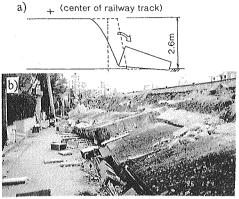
Typical damaged leaning-type unreinforced concrete RW; embankment along JR Tohkaido Line between Setsu-Motoyama and Sumiyoshi Stations (Site LT1 in Fig. 2); a) sketch and b) picture
